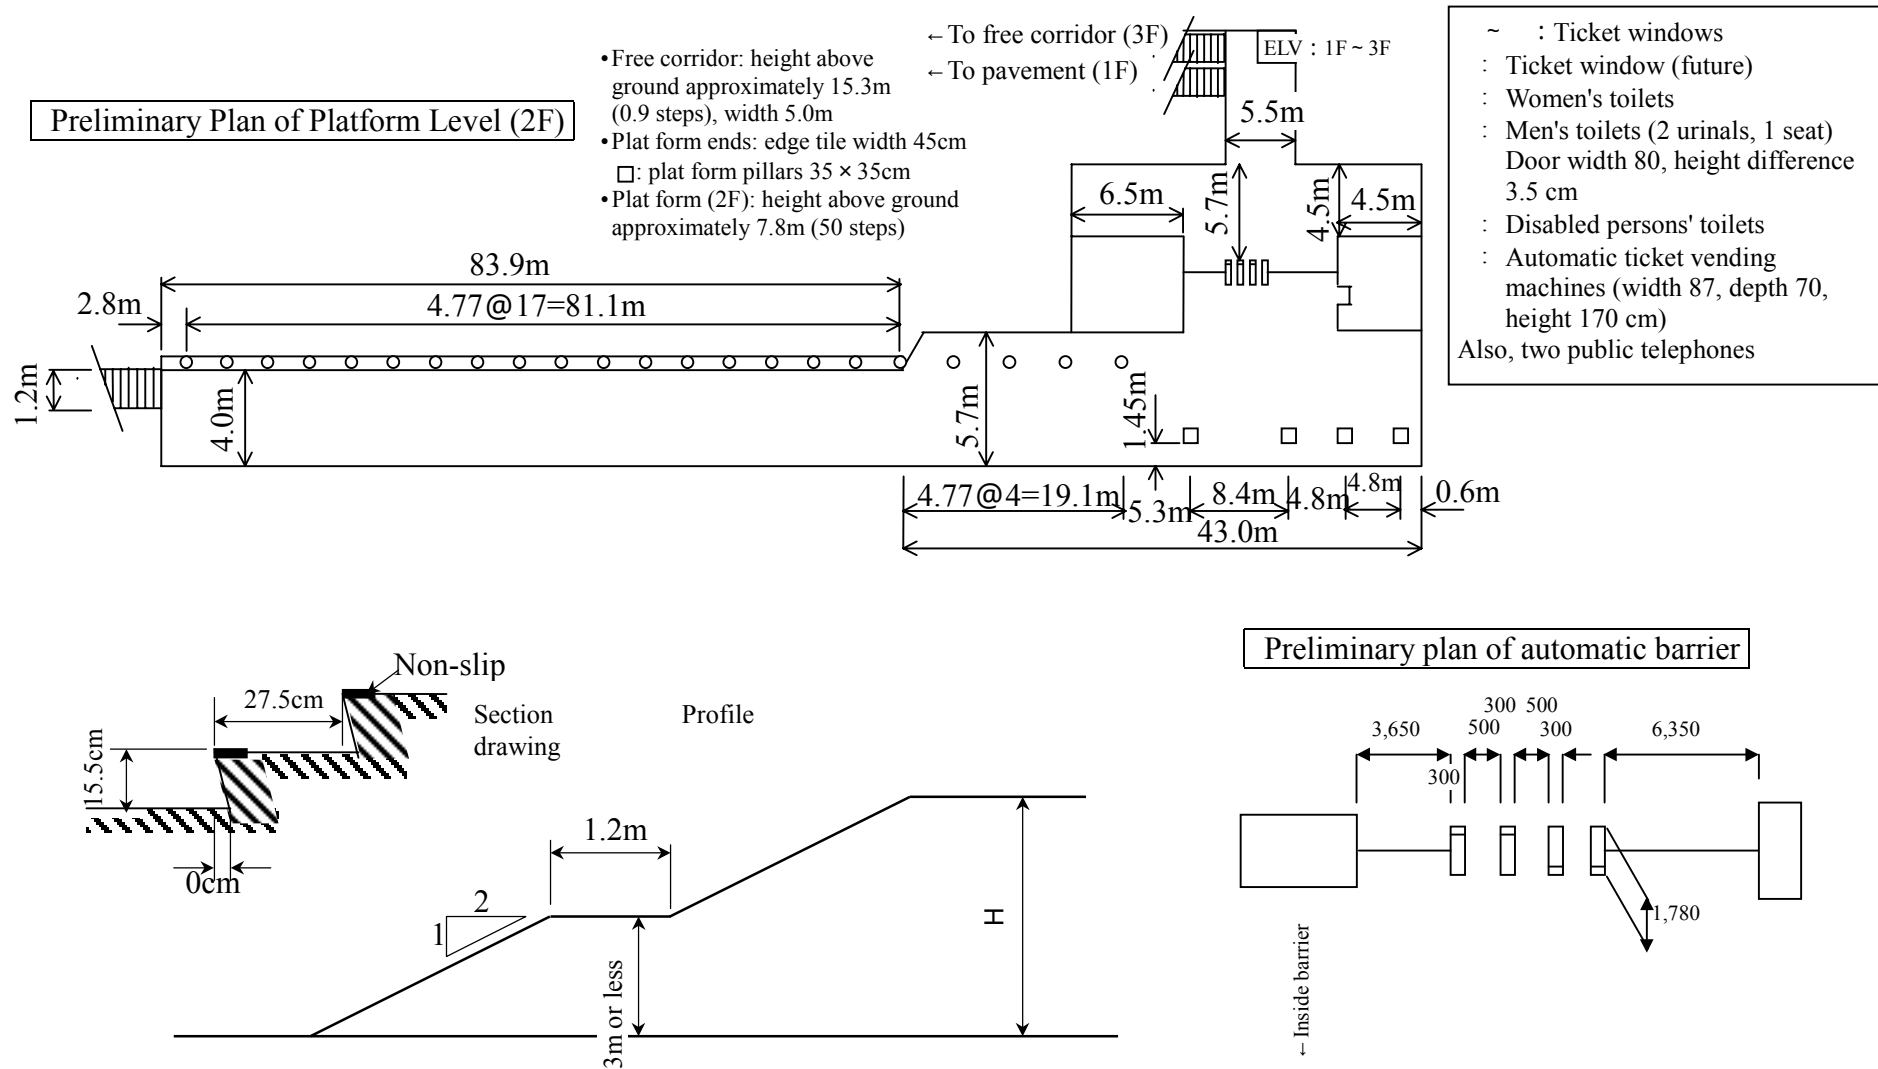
Outline of Existing Facilities at Magallanes Station
